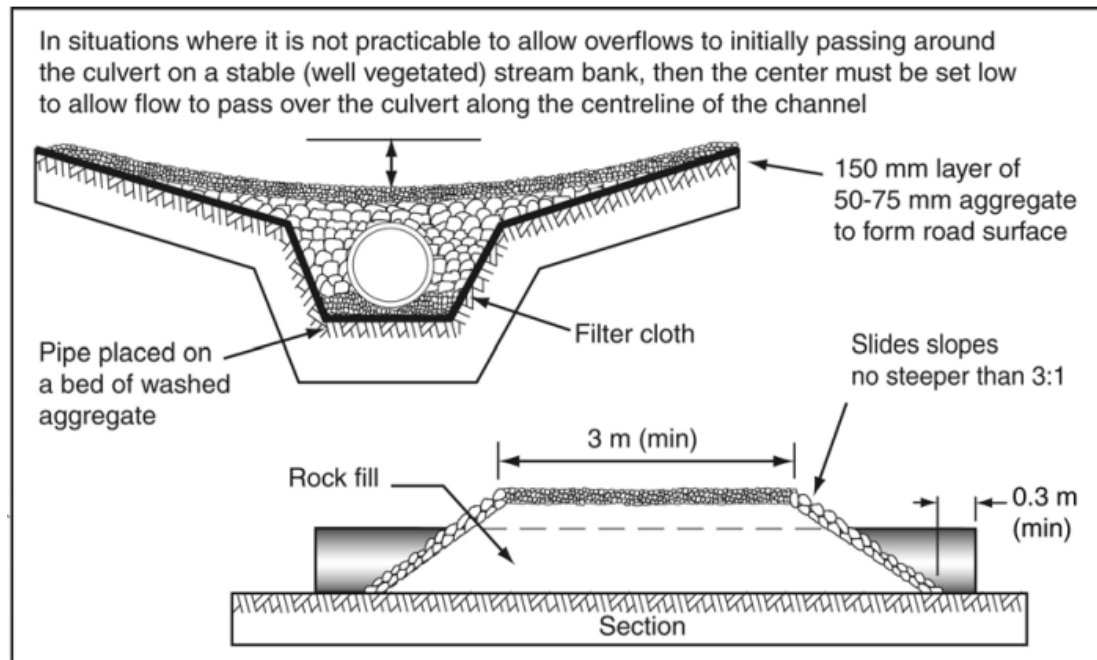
Typical temporary culvert crossing in a constricted channel with steep overbanks (IECA, 2008)
